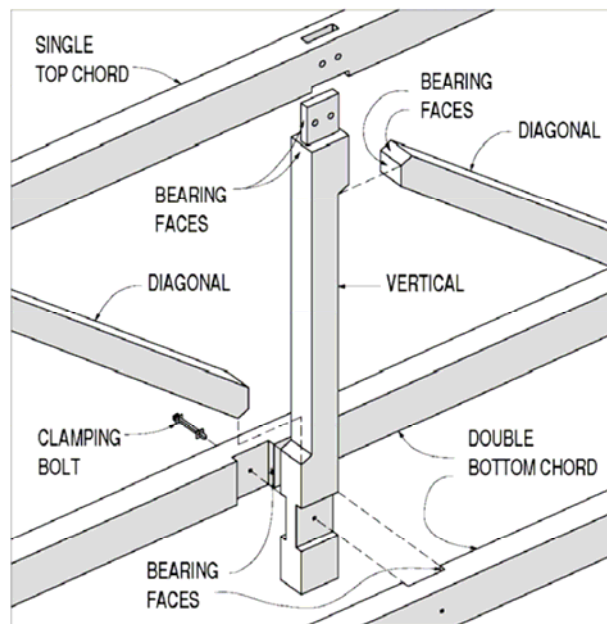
Schematic of connections to the vertical member in a timber truss (Pierce et al. 2005)
